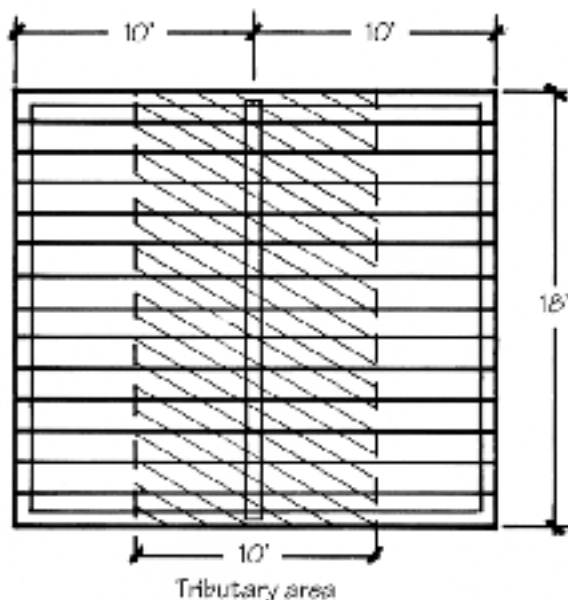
A typical central girder carries half the load of the joists that rest on it — in this case, an area 10 feet wide by the 18-foot length of the beam.
